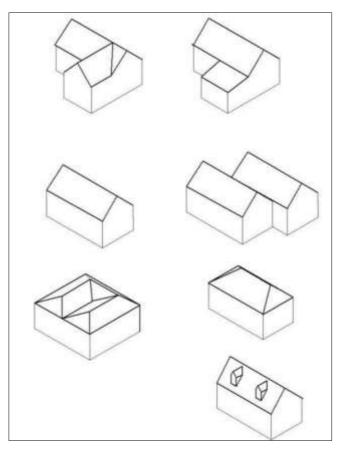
Roof forms as required by clause NOR-S5.7.2 A1
